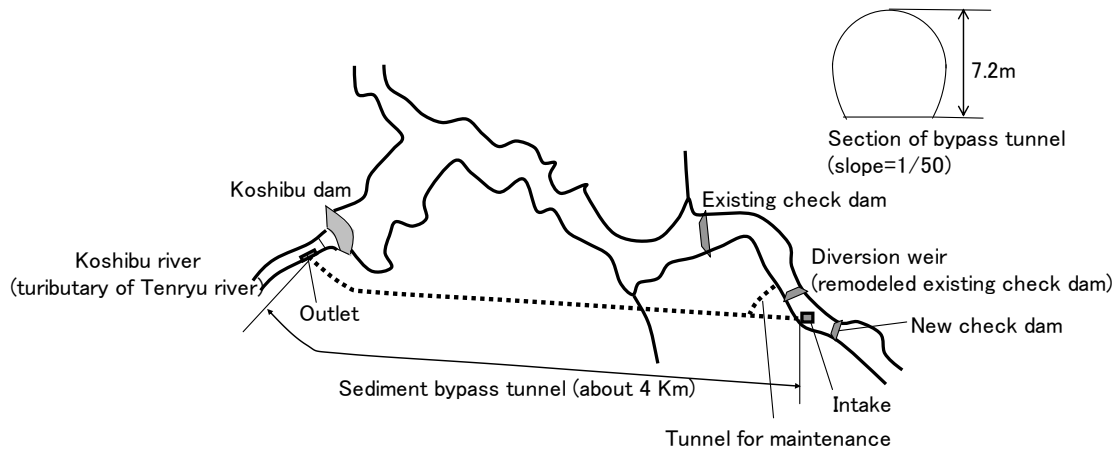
Outline of sediment bypass facilities of Koshihbu dam
